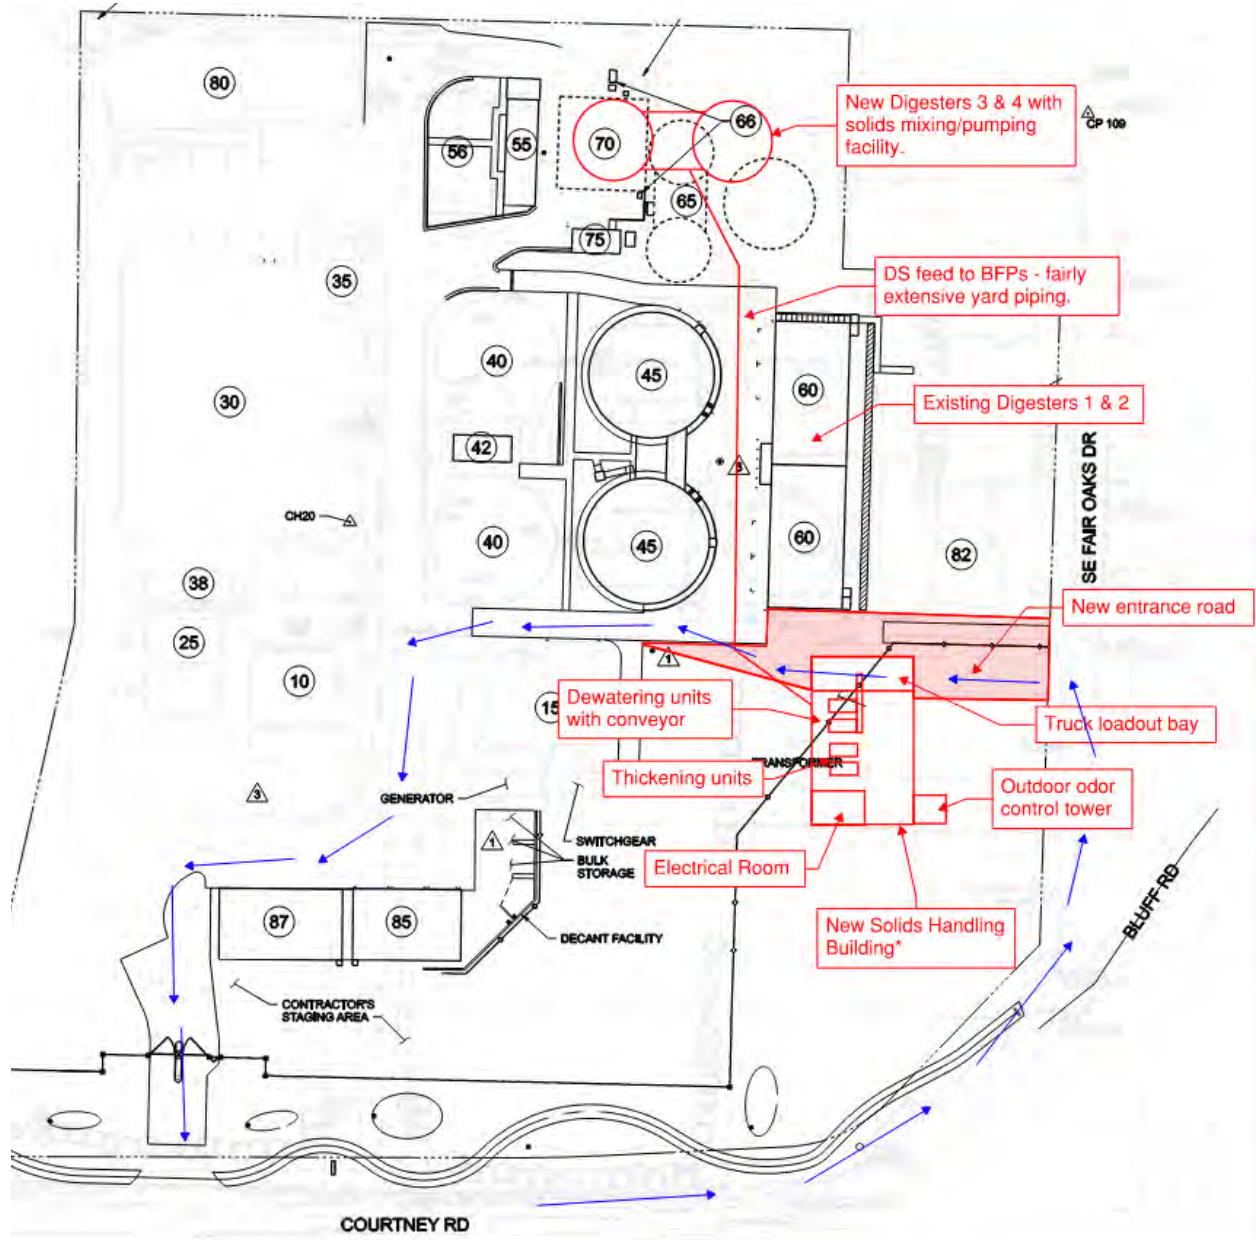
Alternative 3 - South Solids Handling Facility and North Circular Digesters
